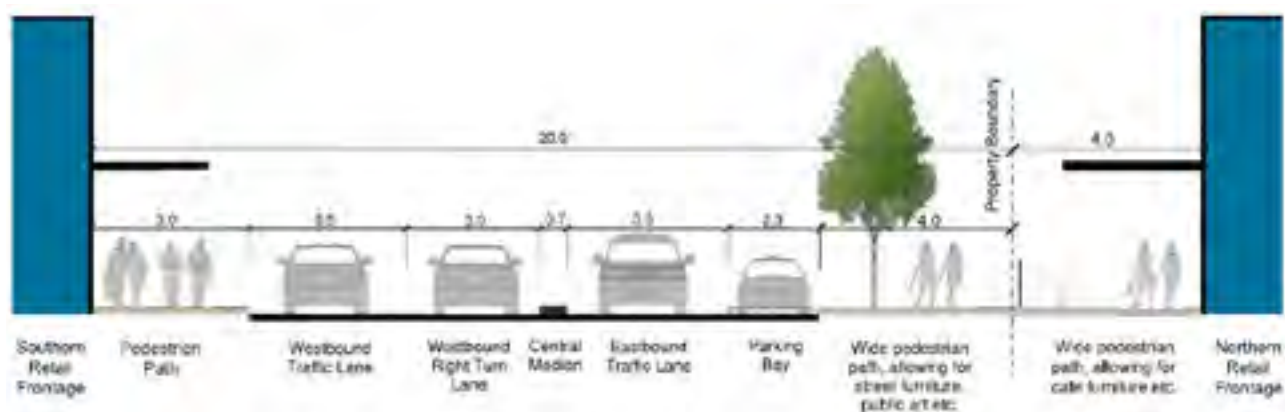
Queen Street Cross Section from Wellington Street to High Street
